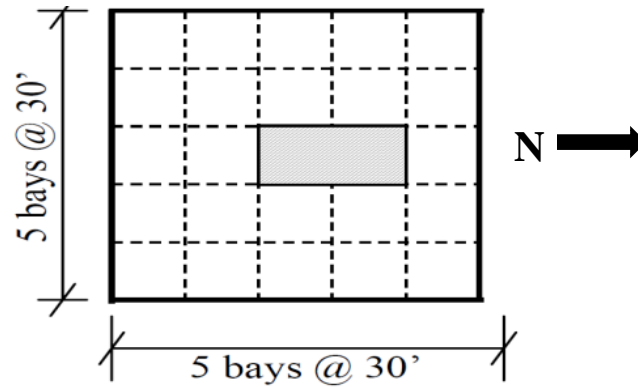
Plan view of LA building (Source: FEMA 355c, Appendix B)
